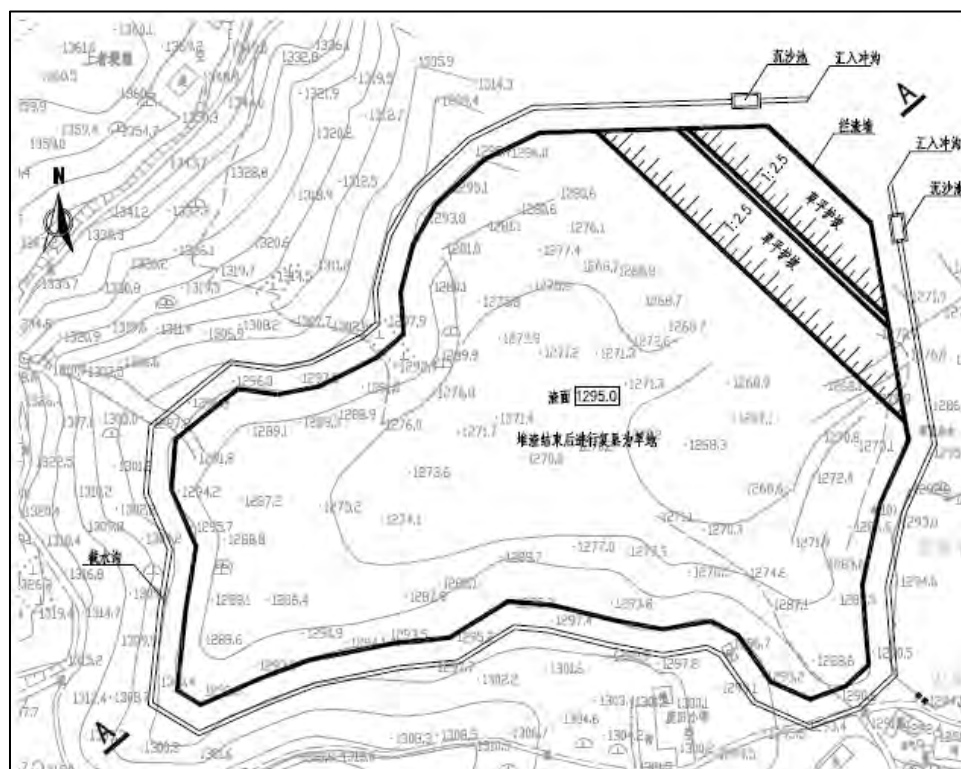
Layout Plan for #1 Spoil Site for Pingqiao Dam Component
